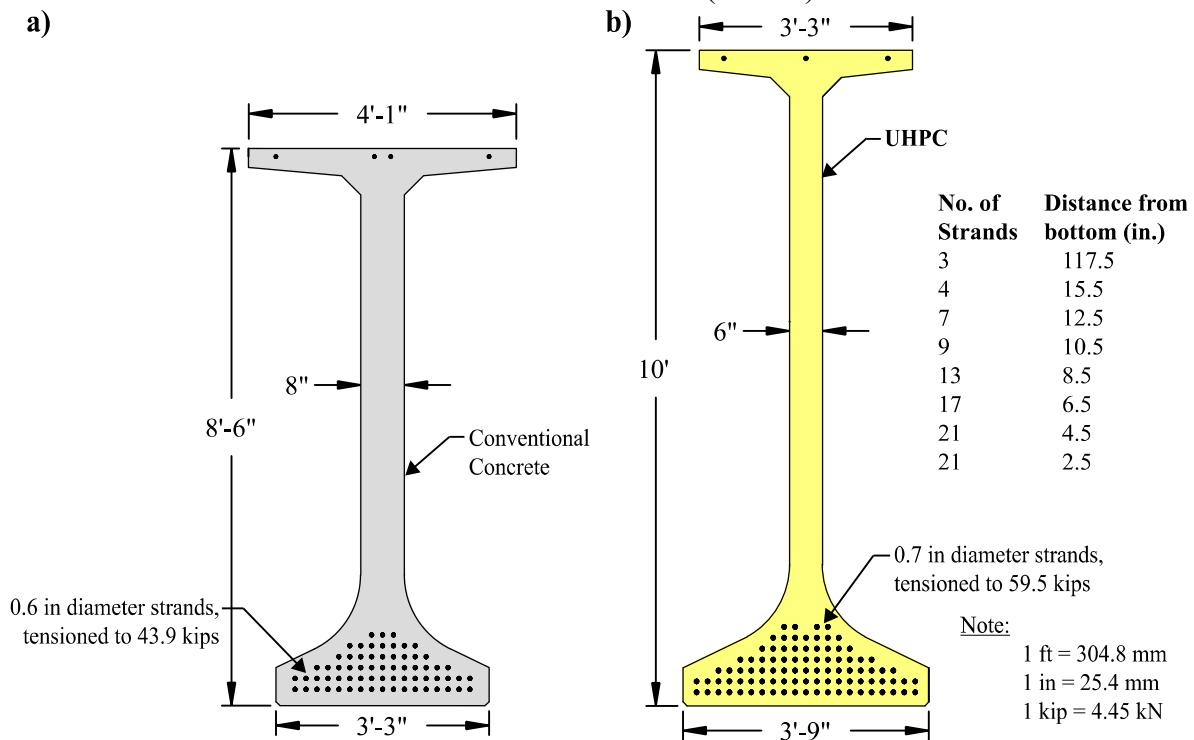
Cross-sectional geometry of (a) F.I.B. 102 and (b) proposed UHPC section.
